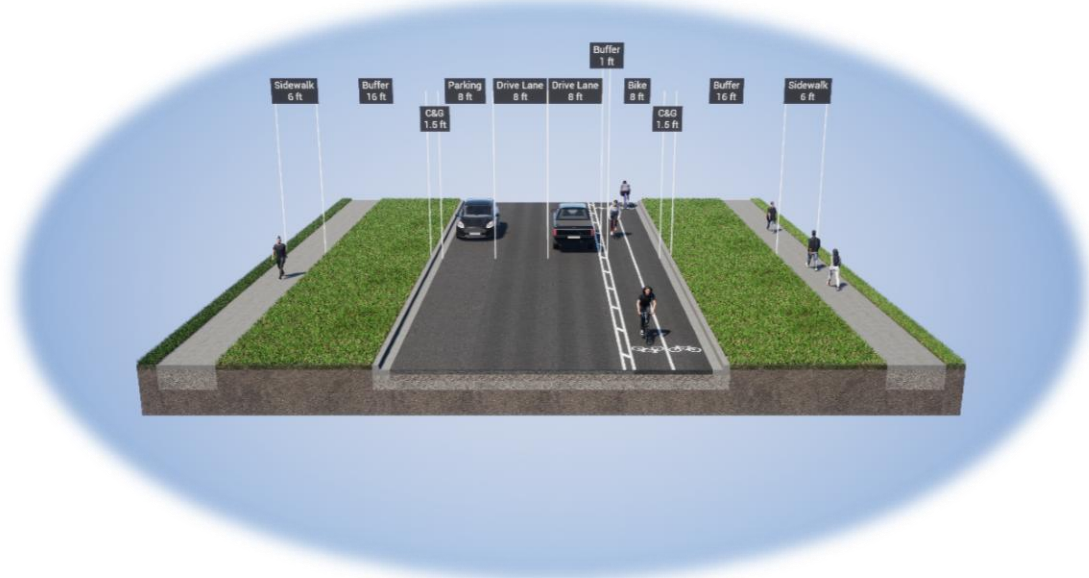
Existing 9<sup>th</sup> Street Cross Section from Hill Ave to North Ave
